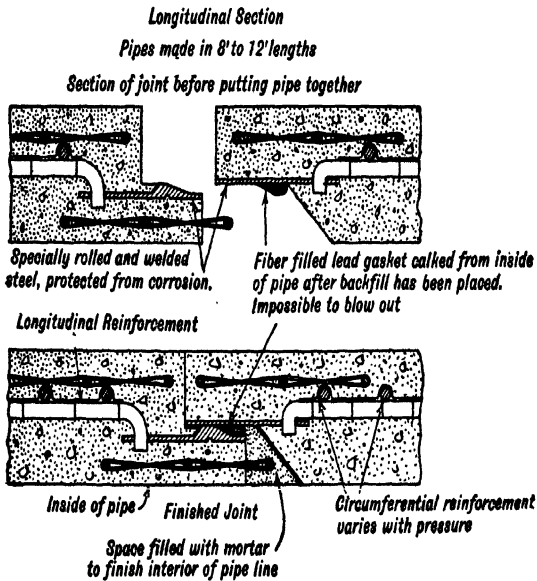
A Type of Joint as Used for Composite Reinforced Concrete Pipe for Heads up to 300 Feet.
